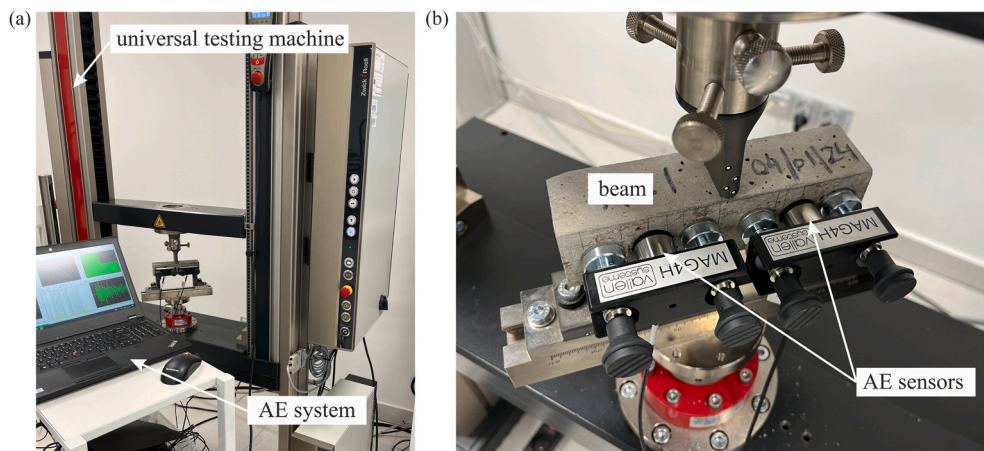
Experimental setup for 3-point bending test (a) and specimen with the location of AE sensors (b).
